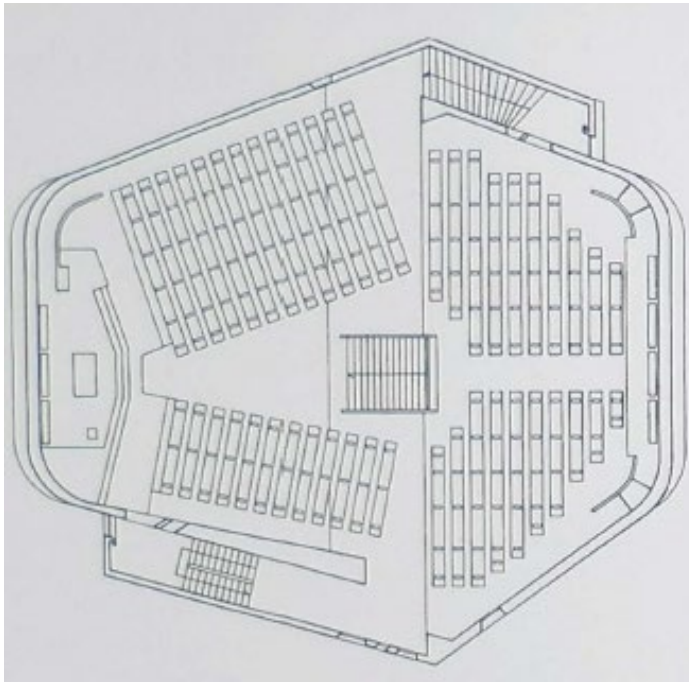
Sainte-Bernadette du Banlay Church's Plan, Claude Parent, Nevers, 1963-1966.
